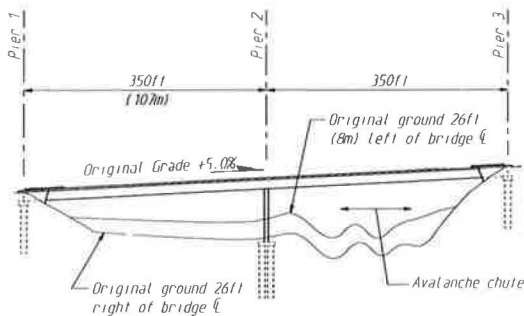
Elevation of Franklin Falls Bridge before jacking.
